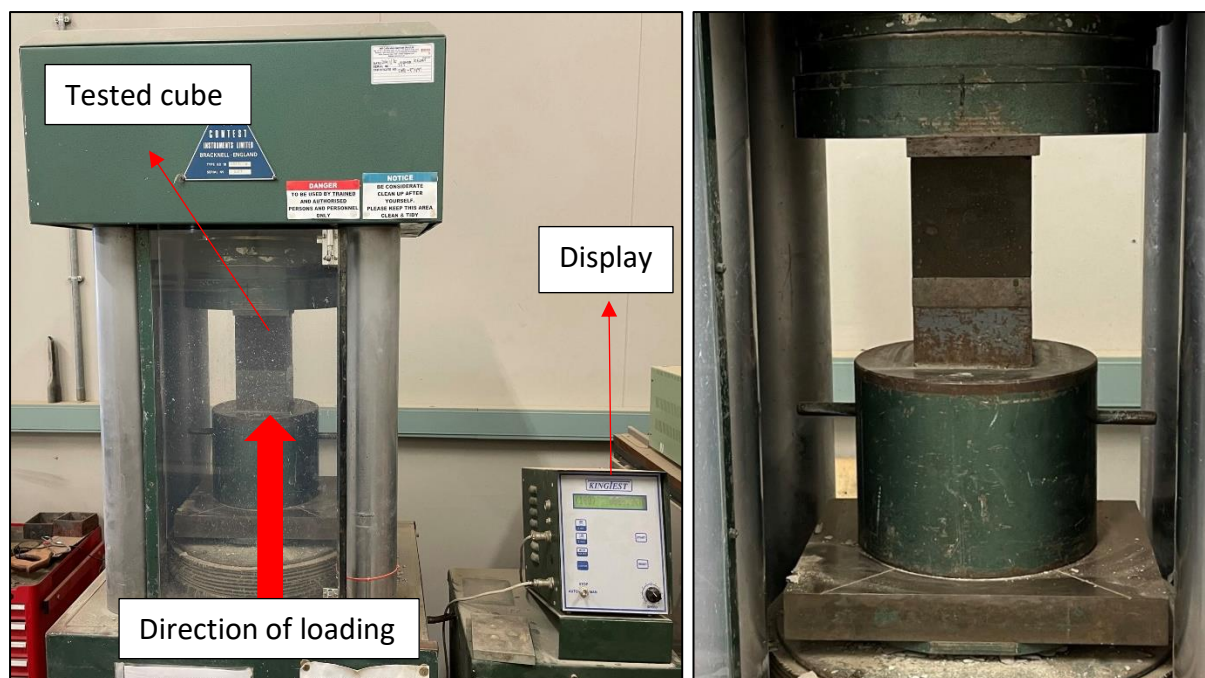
KINGTEST CONTEST MACHINE AND CUBE SETUP
